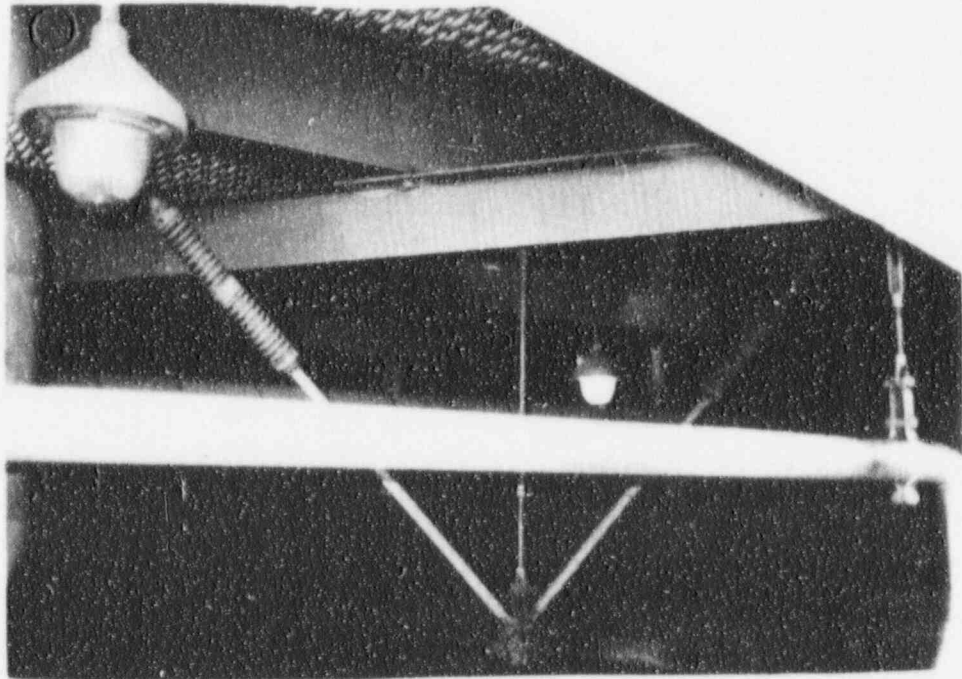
Typical Sway Brace Used in Support of Pipe Valley Unit 1
